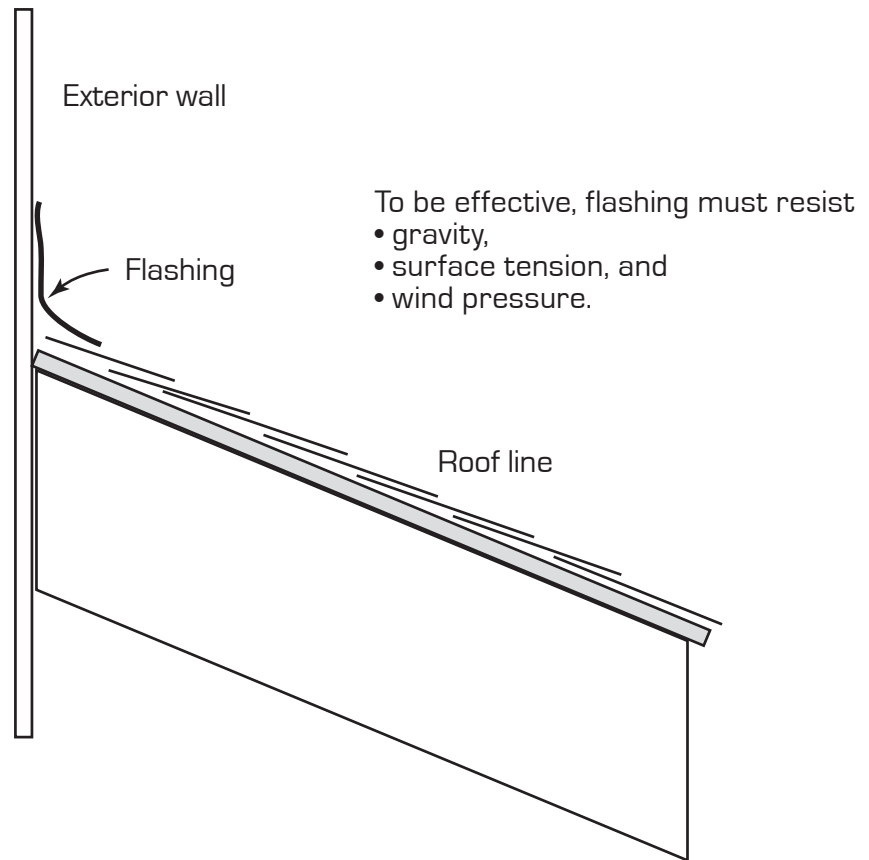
Flashing is applied where a wall meets a roof line, such as above a bay window.
